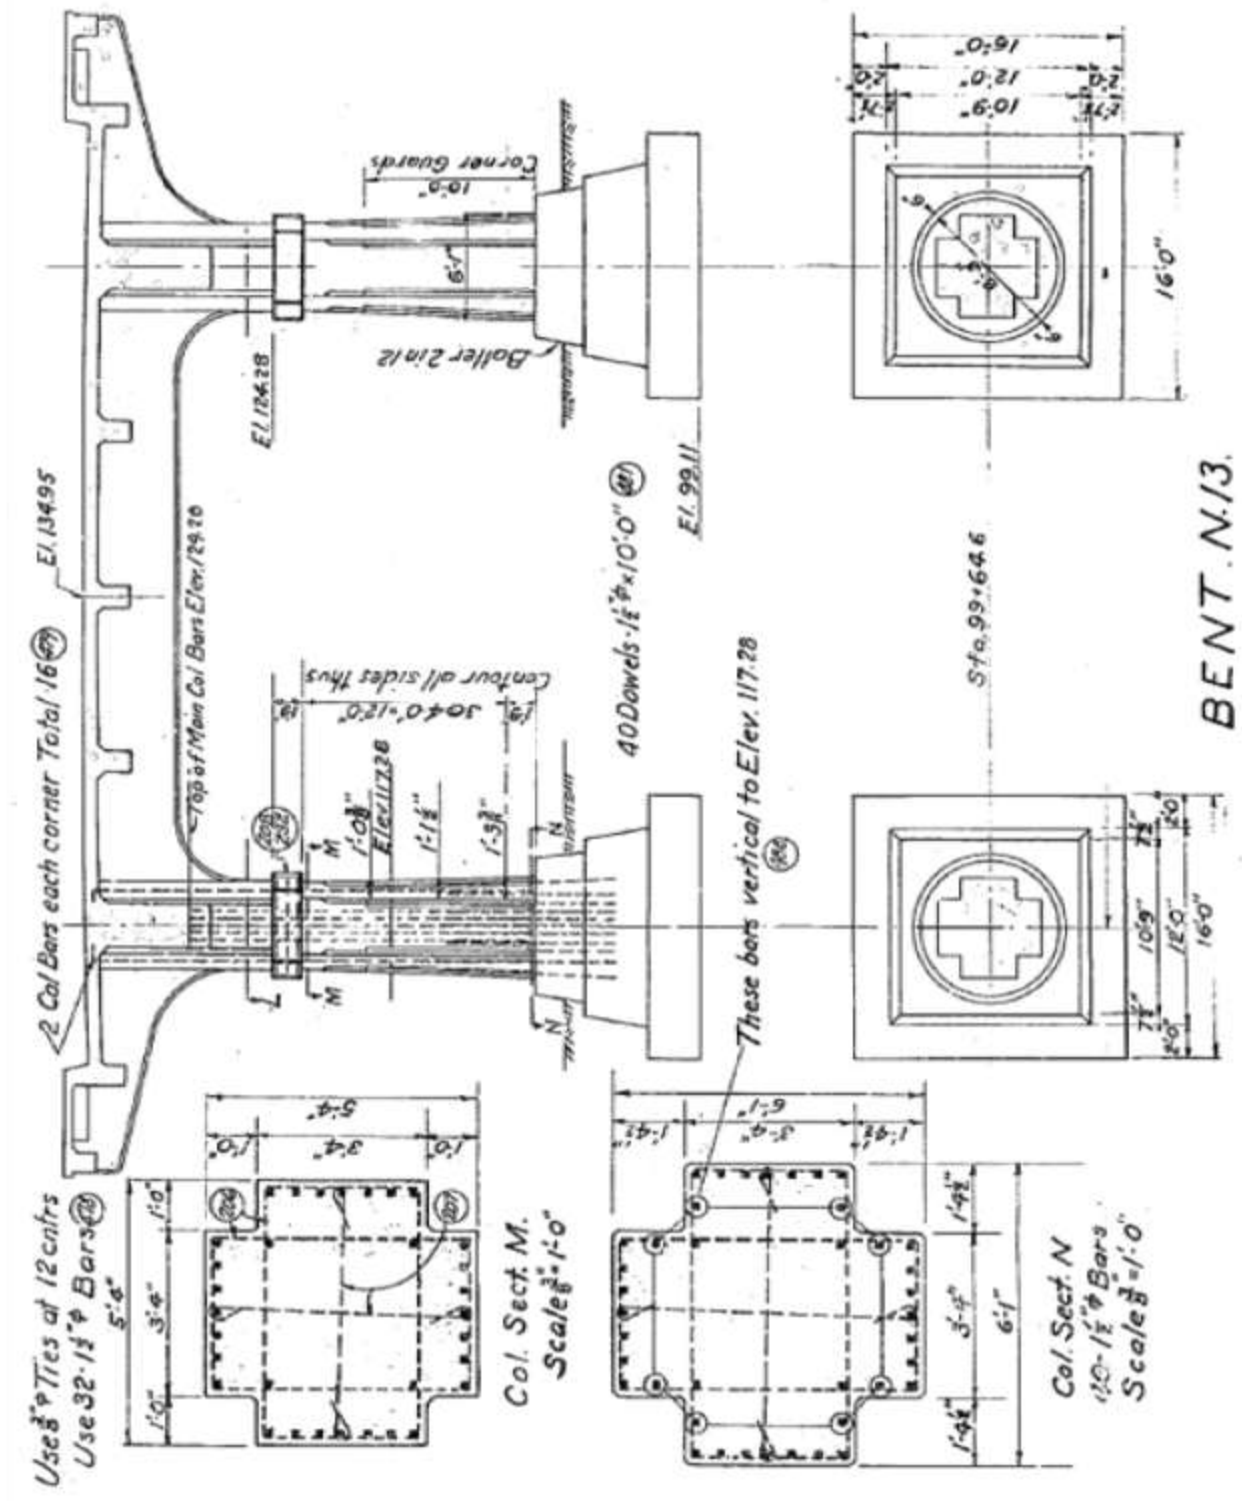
Solid Column As-Built Details (1 in. = 25.4 mm)
